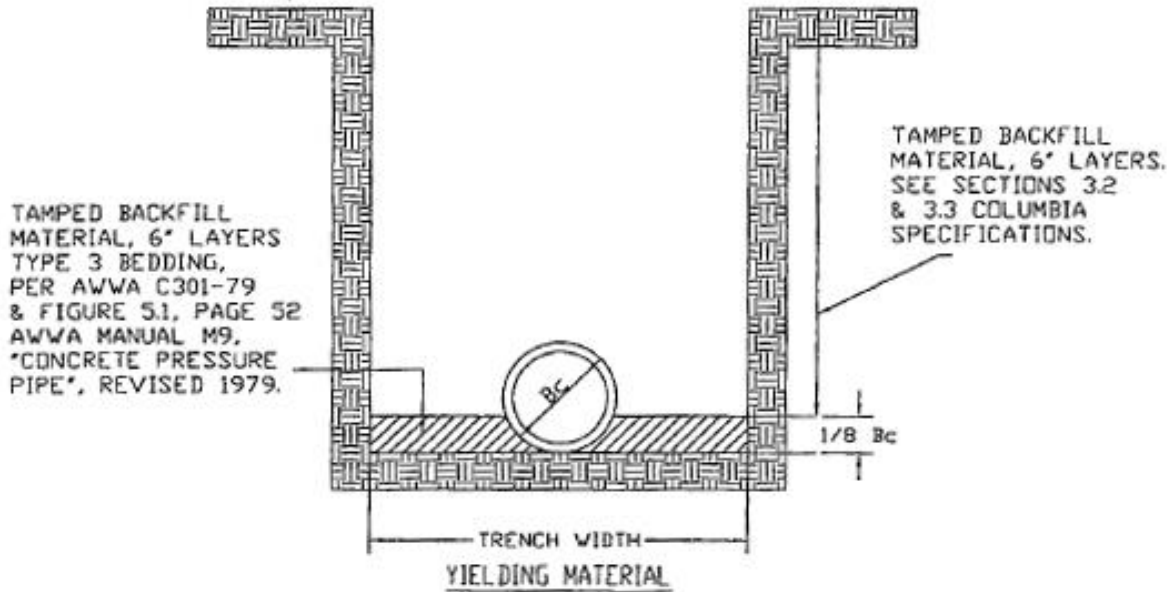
Standard Pipe Bedding and Backfilling Detail - Backfill for Ductile Iron Pipe and Backfill for Gray Cast Iron Pipe
